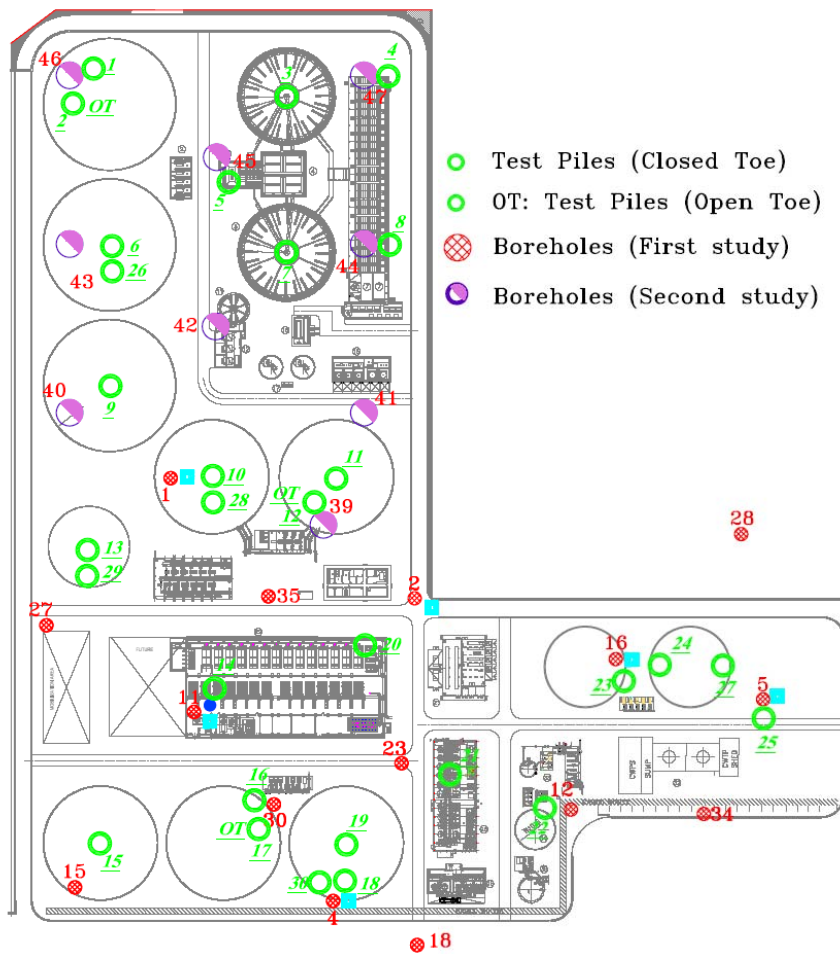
Plan view of water unit structures, boreholes and test pile locations, Fajr II, Mahshahr, Iran
